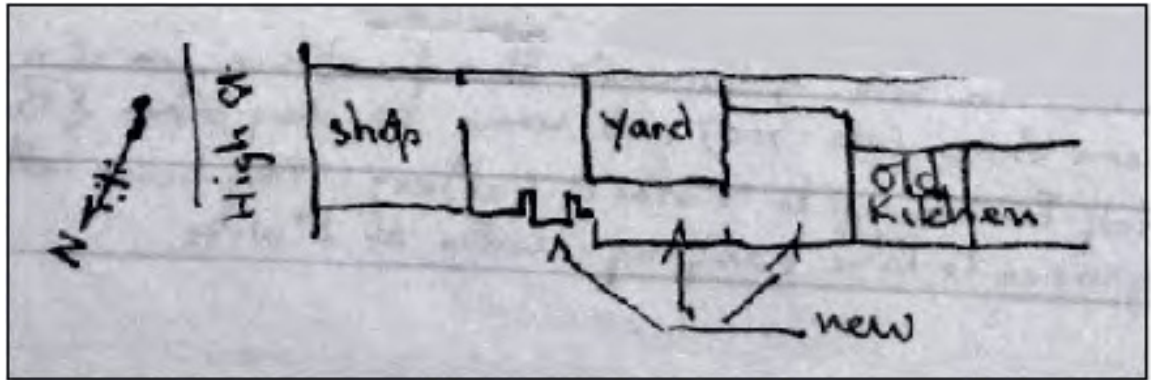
Sketch plan by Bruce Oliver, 1947: Conjectural reconstruction of the ground plan of around 1550.
